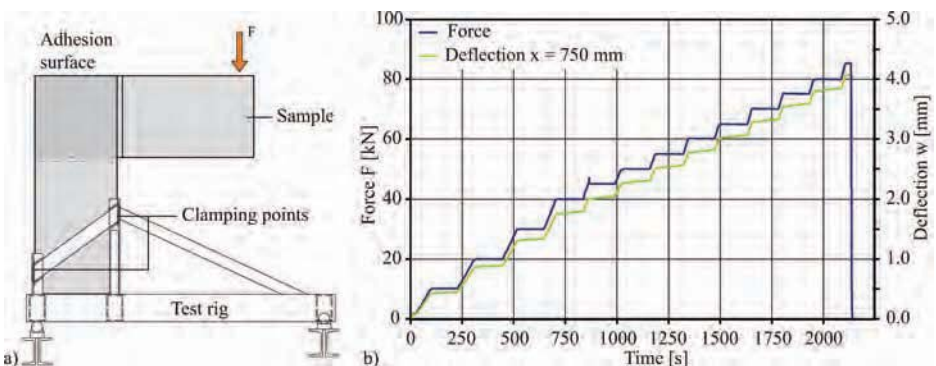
(a) Loading test setup (schematic), and (b) load and deflection in component testing, frame SC7.
